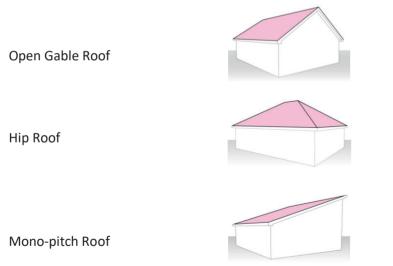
Roof types (Hip Roof vs. Gable Roof - Pros & Cons of Each Type (roofingcalc.com))
